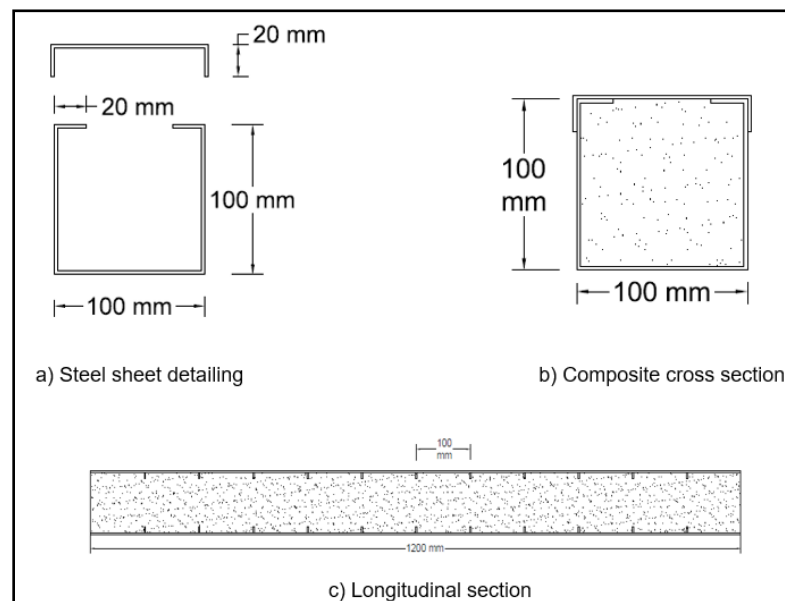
Composite Beams Sections: (a) steel sheet detailing. (b) composite cross-section. (c) Longitudinal section (Al Zand et al., 2021).
